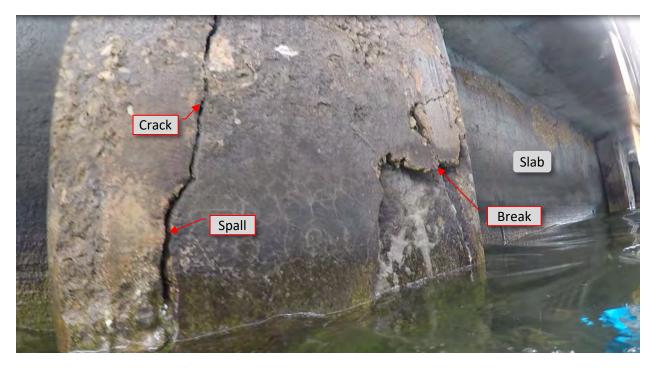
P35. STA 5+40. Cracks/spalls at both flanges at pile and loss of concrete. View of west flange.
